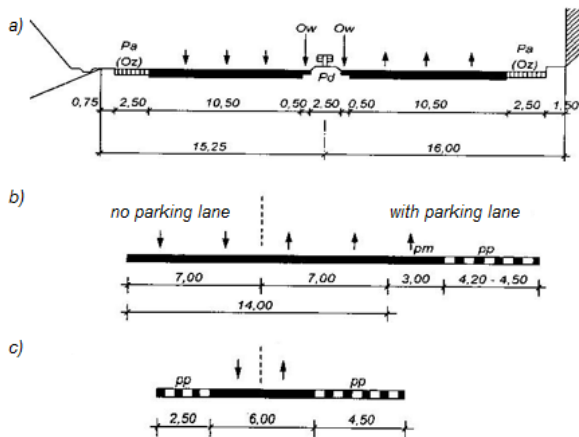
The examples of cross-sections of roads: a) E (urban express road); b) G (main road); c) L (local road) [1]
